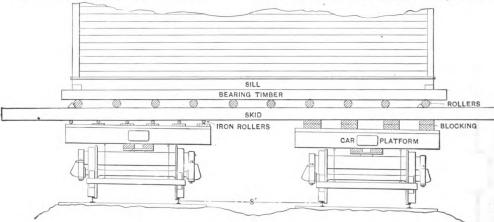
End Elevation of Building, Showing Skids, Cars, &c.
